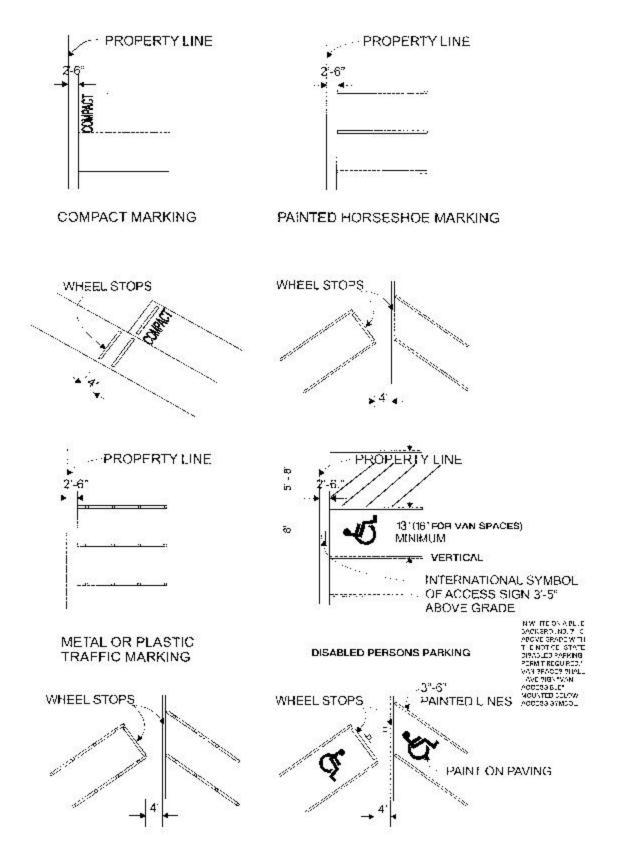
(F): Pavement marking and wheel stop standards.
